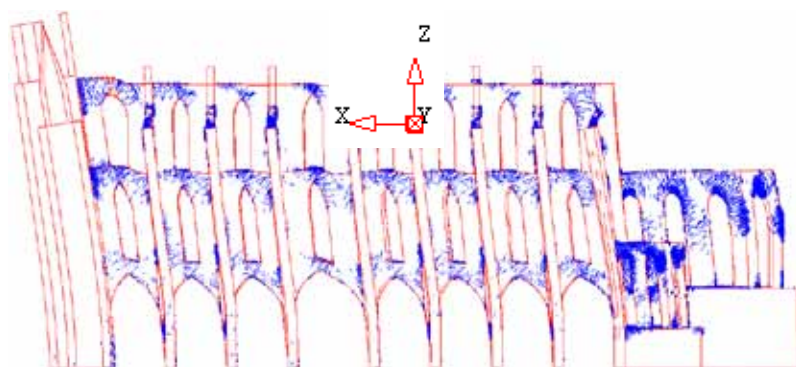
Crack patterns (in blue) at apse walls and frame of buttresses and lower clerestory wall (case of +X earthquake)
